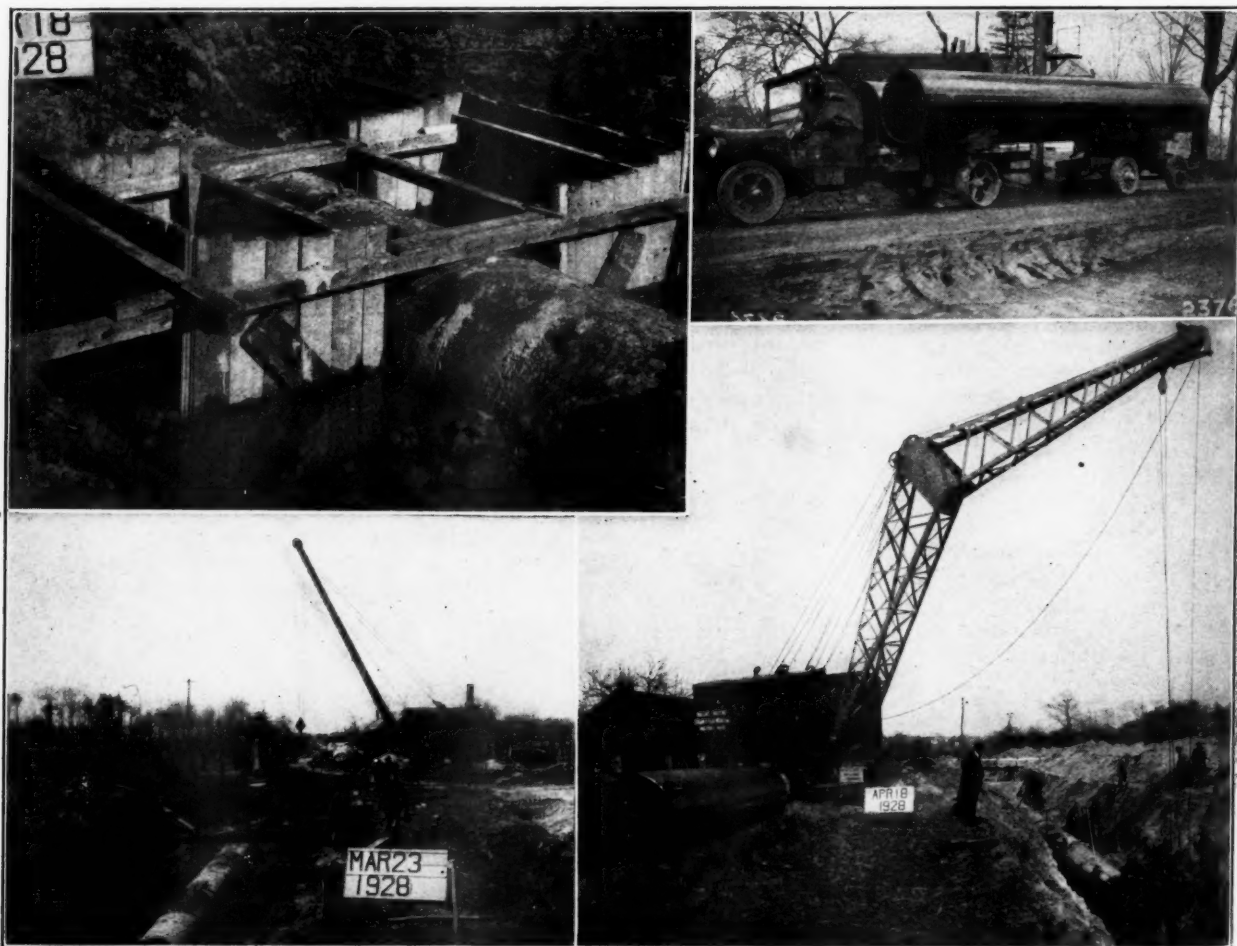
(UPPER LEFT) TIMBER COFFERDAM AROUND JOINT IN WET GROUND. FIG. 4 (UPPER RIGHT) HAULING PIPE ON SPECIALLY CONSTRUCTED TRAILER. FIG. 5 (LOWER LEFT) NORTHWEST "PULL-SHOVEL" DIGGING TRENCH FOR PIPE. FIG. 6 (LOWER RIGHT) CRAWLER PLACING PIPE IN TRENCH
